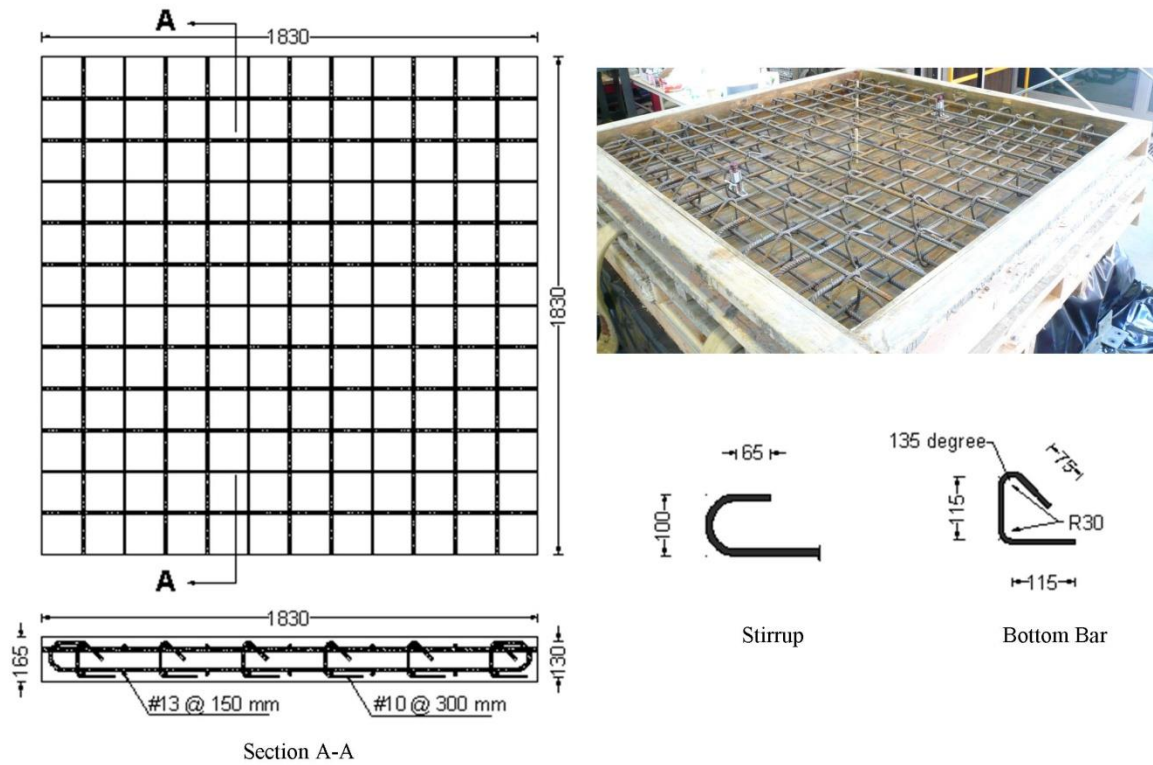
Test Specimen Geometry and Reinforcement Details (Units: mm)
